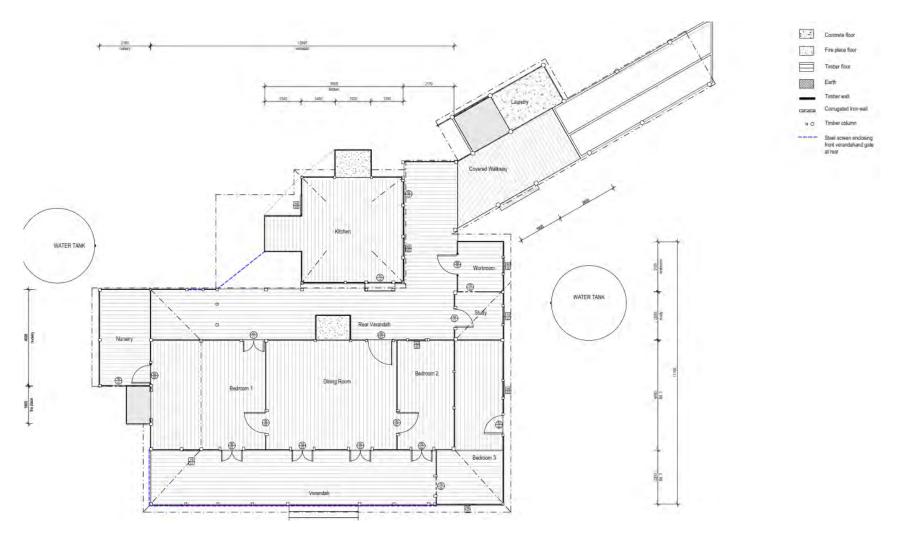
Extract of a floor plan of the main homestead at Boondooma. *Source:* Extract from drawing 21602EX A200, Issue P1, prepared by Gibson Architects (2021).
